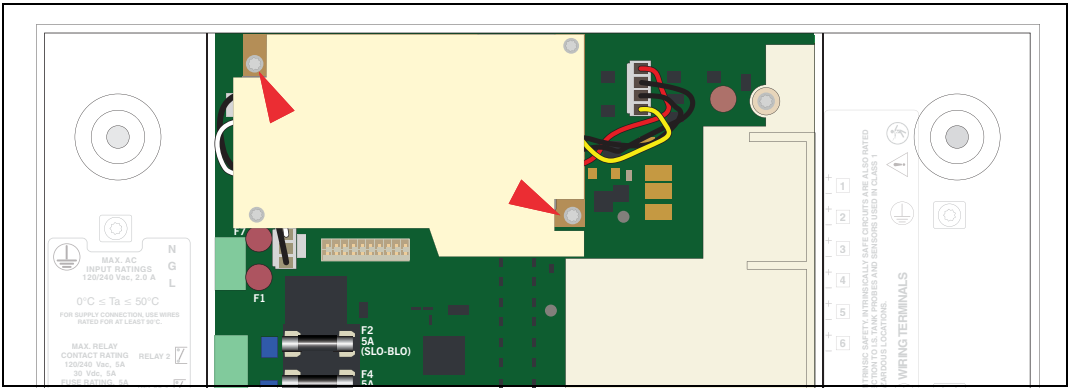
Remove Two Corner T10 Screws From Power Supply Board
